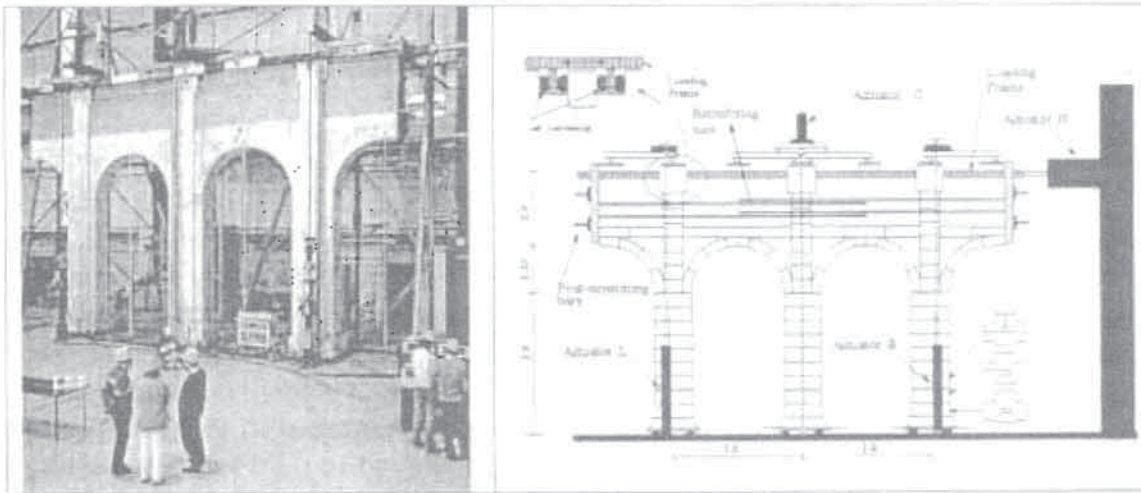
Façade full-scale model in the ELSA reaction wall laboratory (left) and test set-up - schematic (right)
